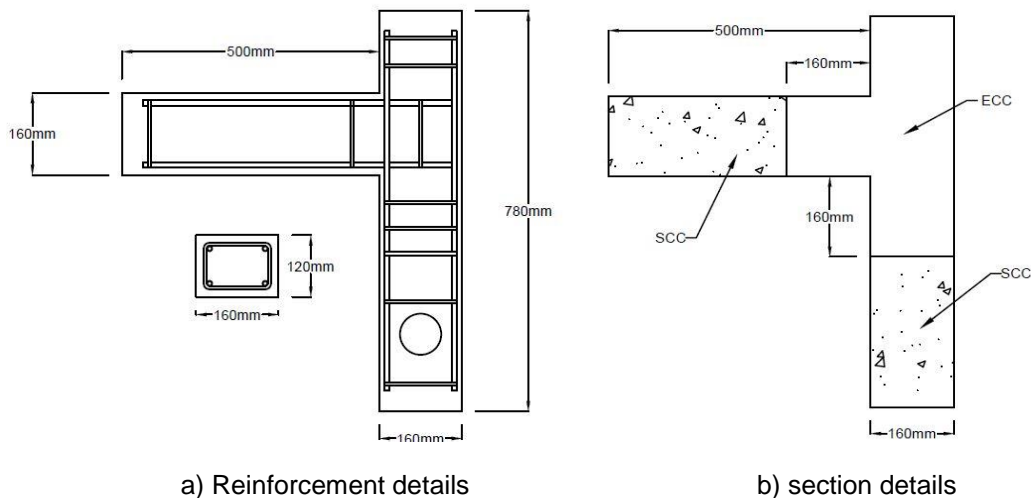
Geometry and reinforcement details of exterior beam-column connection
